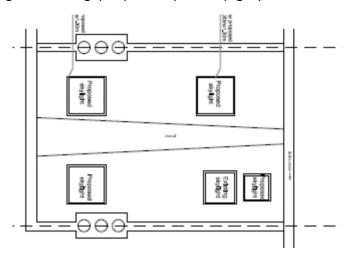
Proposed roof plan (4 rooflights proposed, 1 rooflight is existing and will be retained)
